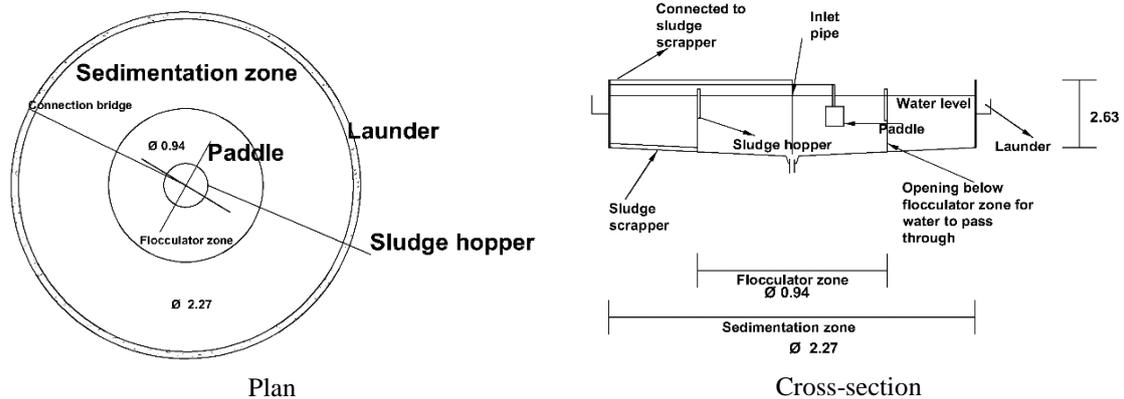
Plan and Cross-section of designed Clariflocculator (dimensions in m, not up to the scale)
